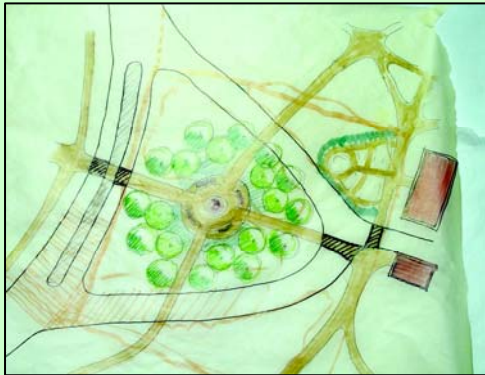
Design for the proposed reconstruction of the Loop Drive
